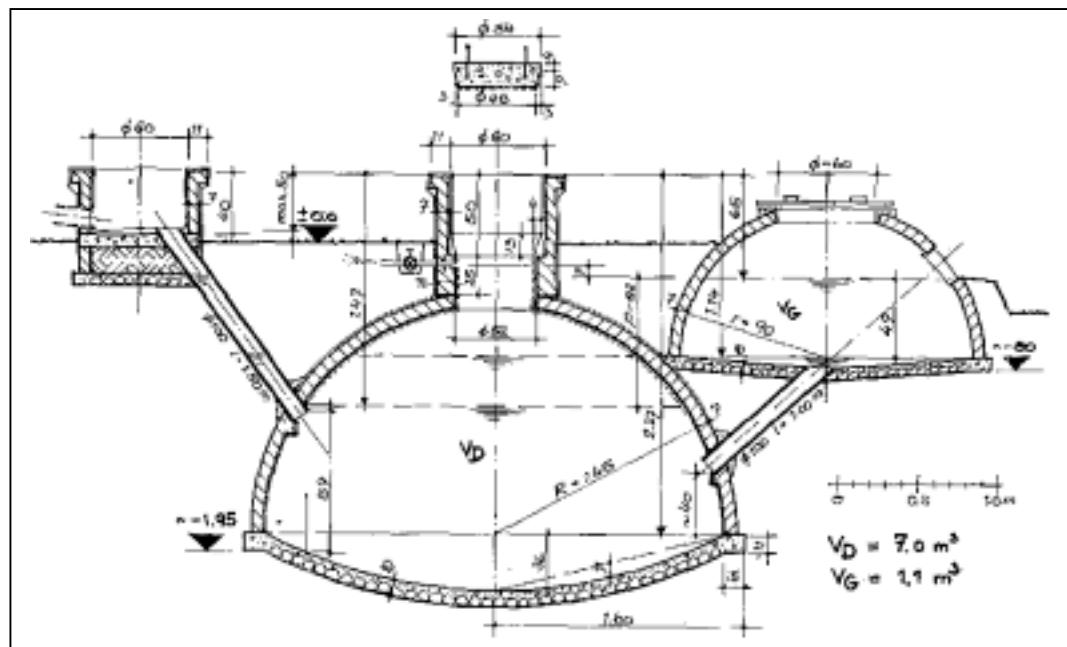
Constructional drawing of a fixed-dome plant with upper opening
